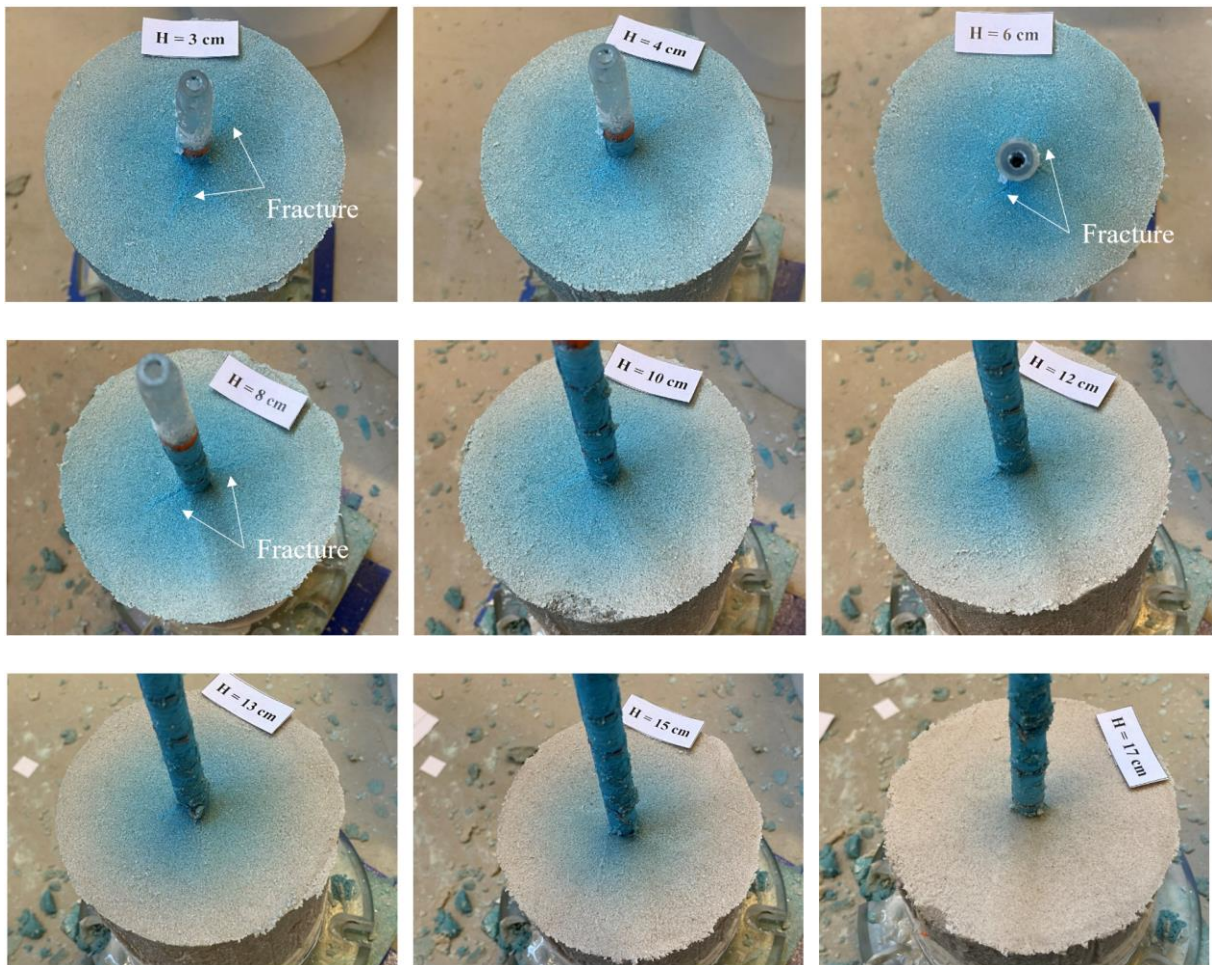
Photos of the horizontal cross-section at the different heights during excavation of specimen SPI.
